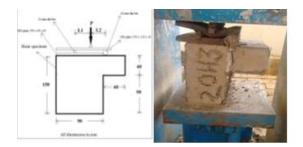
Line diagram L-specimen. Fig. 18: Testing of shear specimen
